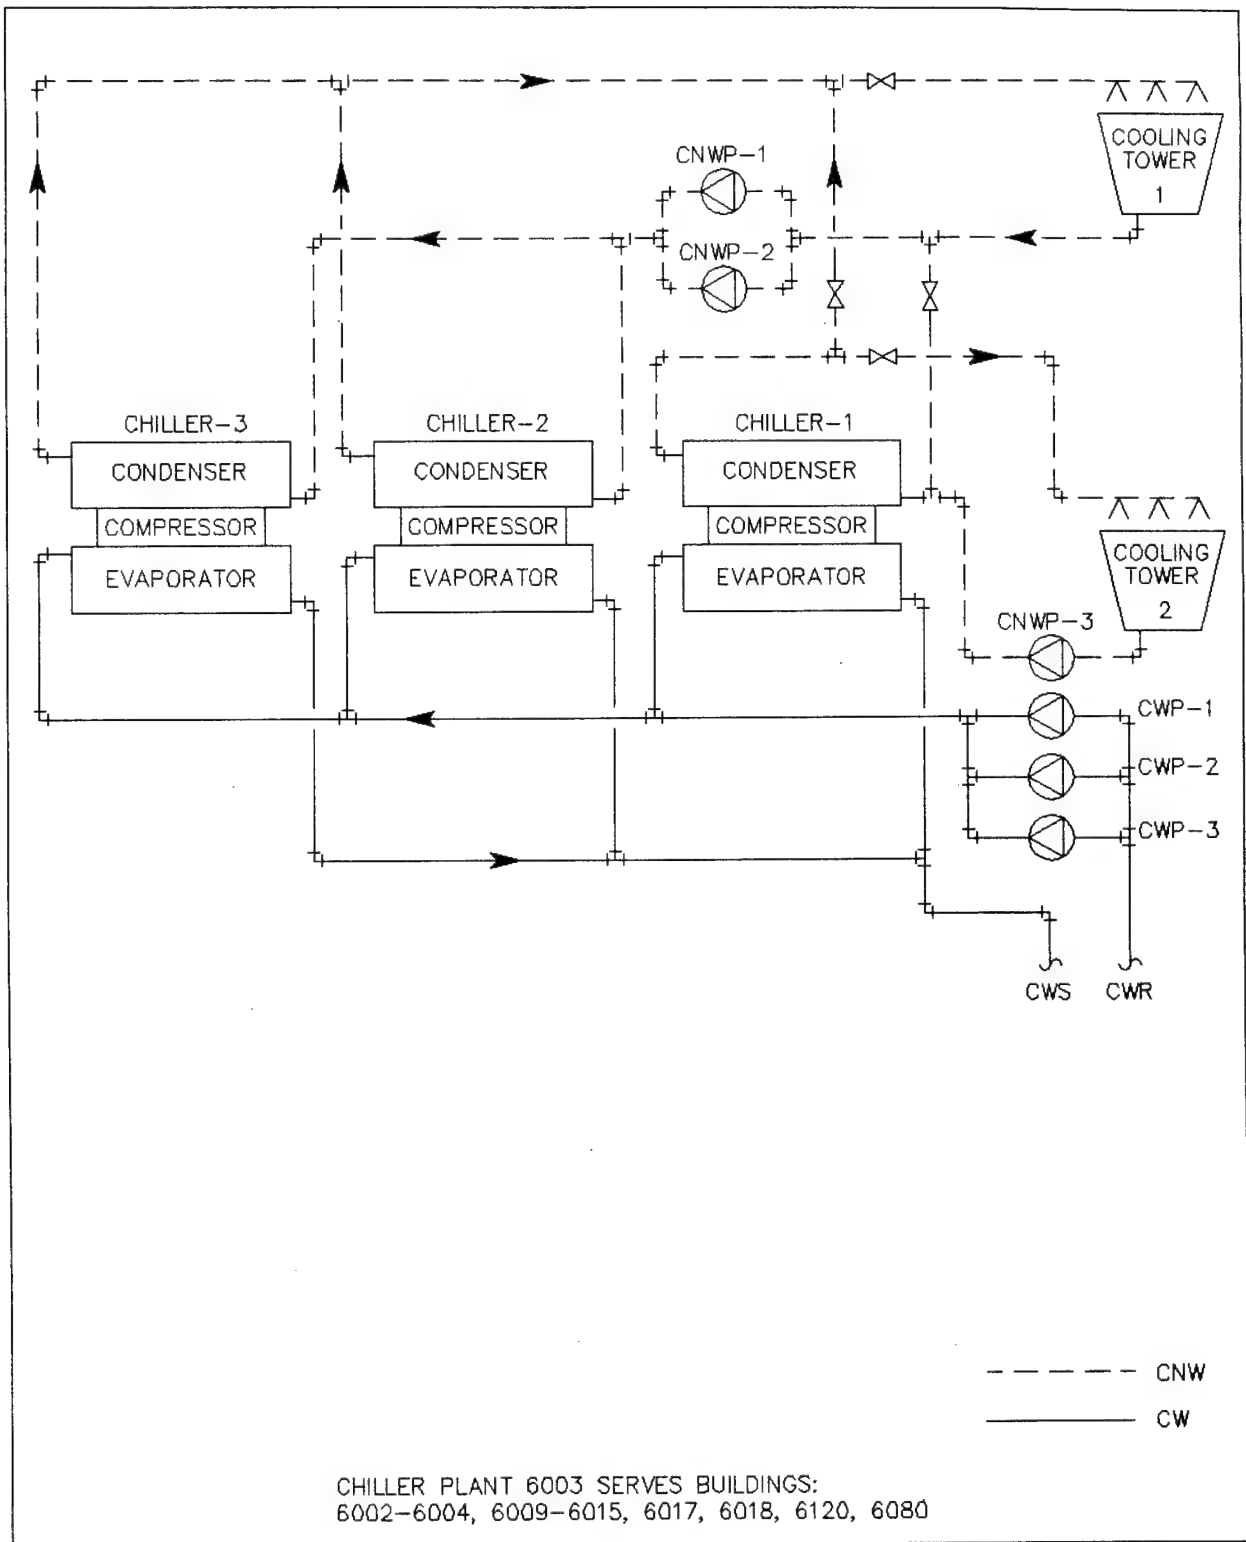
SCHEMATIC OF CHILLERS, CENTRAL PLANT 6003
